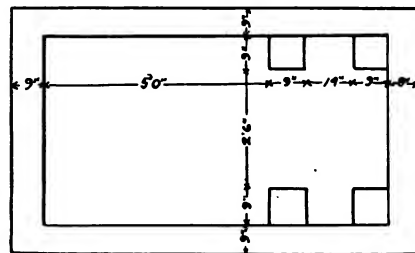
A FLOOR PLAN AND DIMENSIONS
